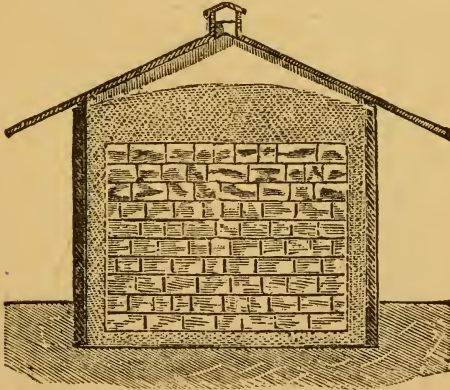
SECTION OF ICE-HOUSE FILLED.
